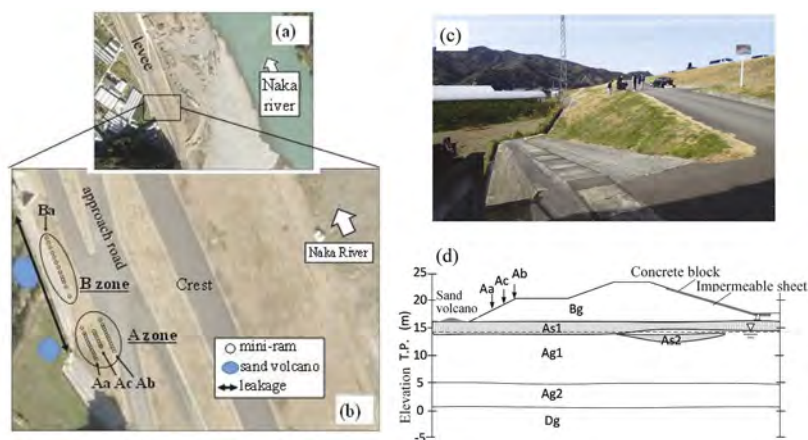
Test site. Location of (a) test site and (b) mini-ram sounding, (c) photo of Zone A and B, and (d) cross section showing soil condition in the levee and foundation.
